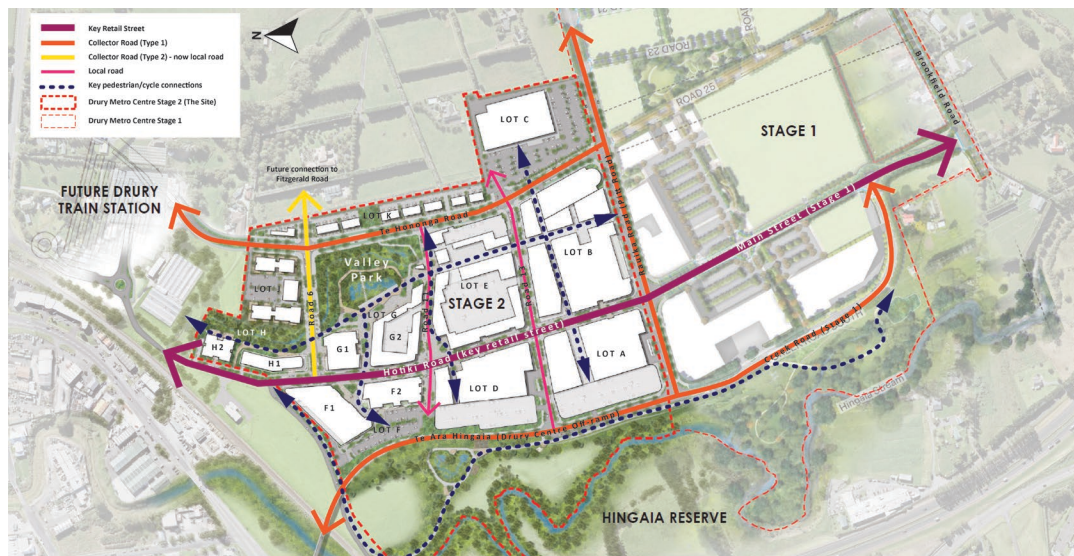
The Site (Stage 2) in the context of Stage 1 and the Future Drury Tran Station, with the key connections and proposed Lot/Block layout.
